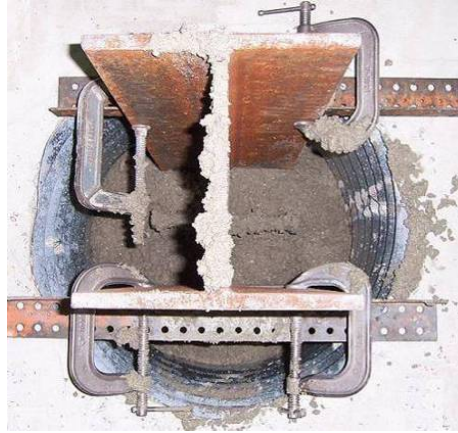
Double pile abutment specimen H-pile before being fully grouted
